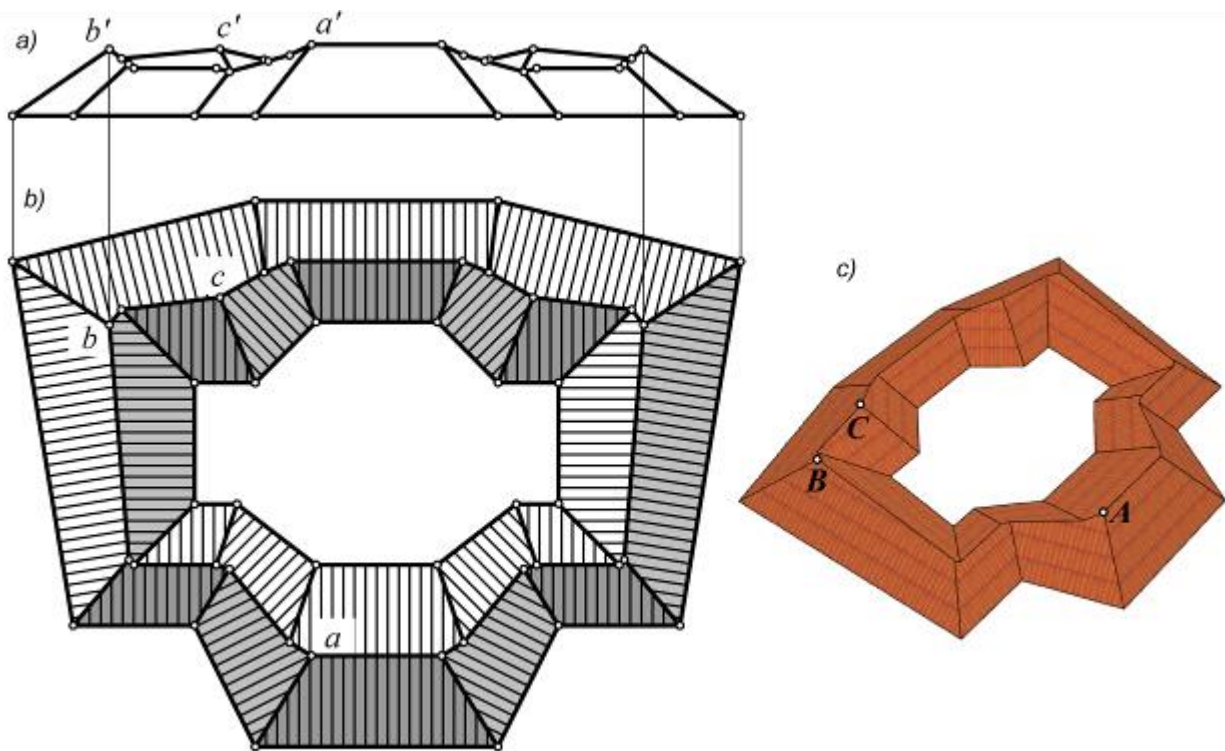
Frontal projection (a), top view (b) and perspective (c) of the roof of a building with a complex outline with an inner courtyard
